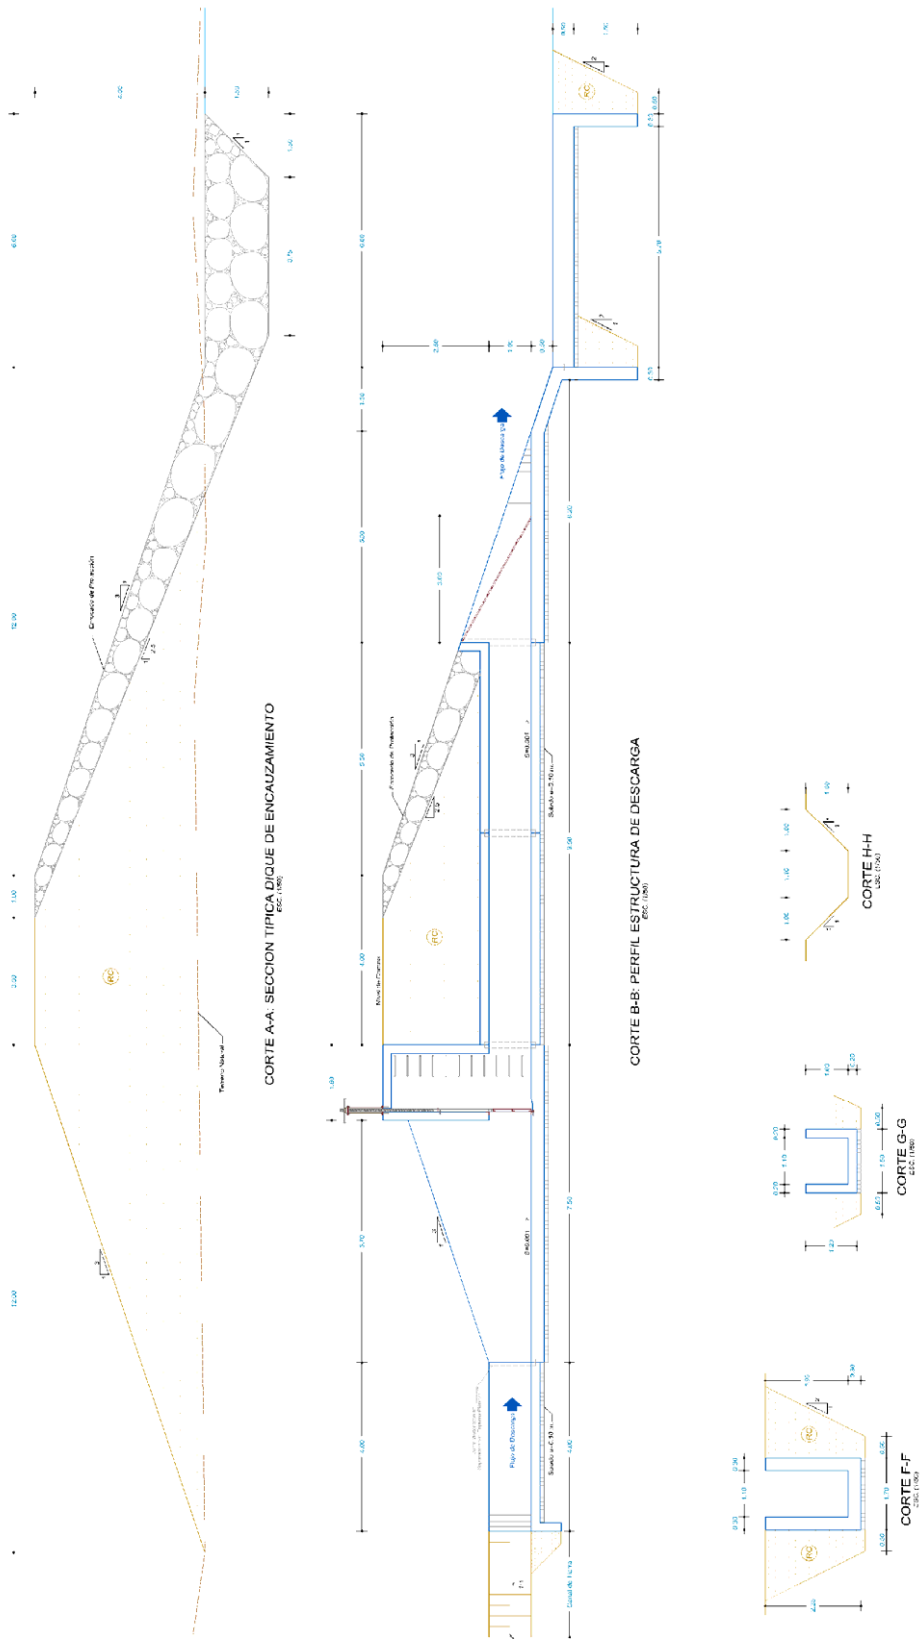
Structure Drawing of Drainage Facility Type I (2/2)
